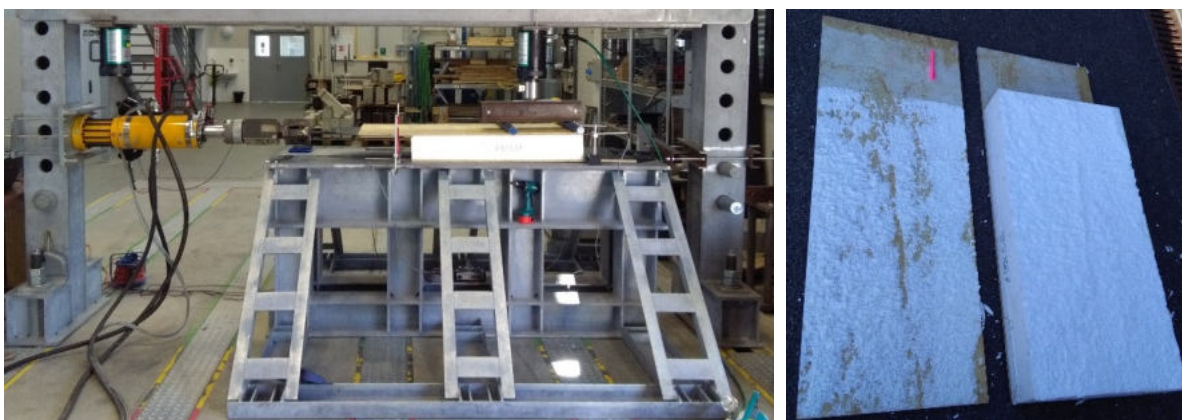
Verification of the mechanical properties of bonded sandwich construction panels
